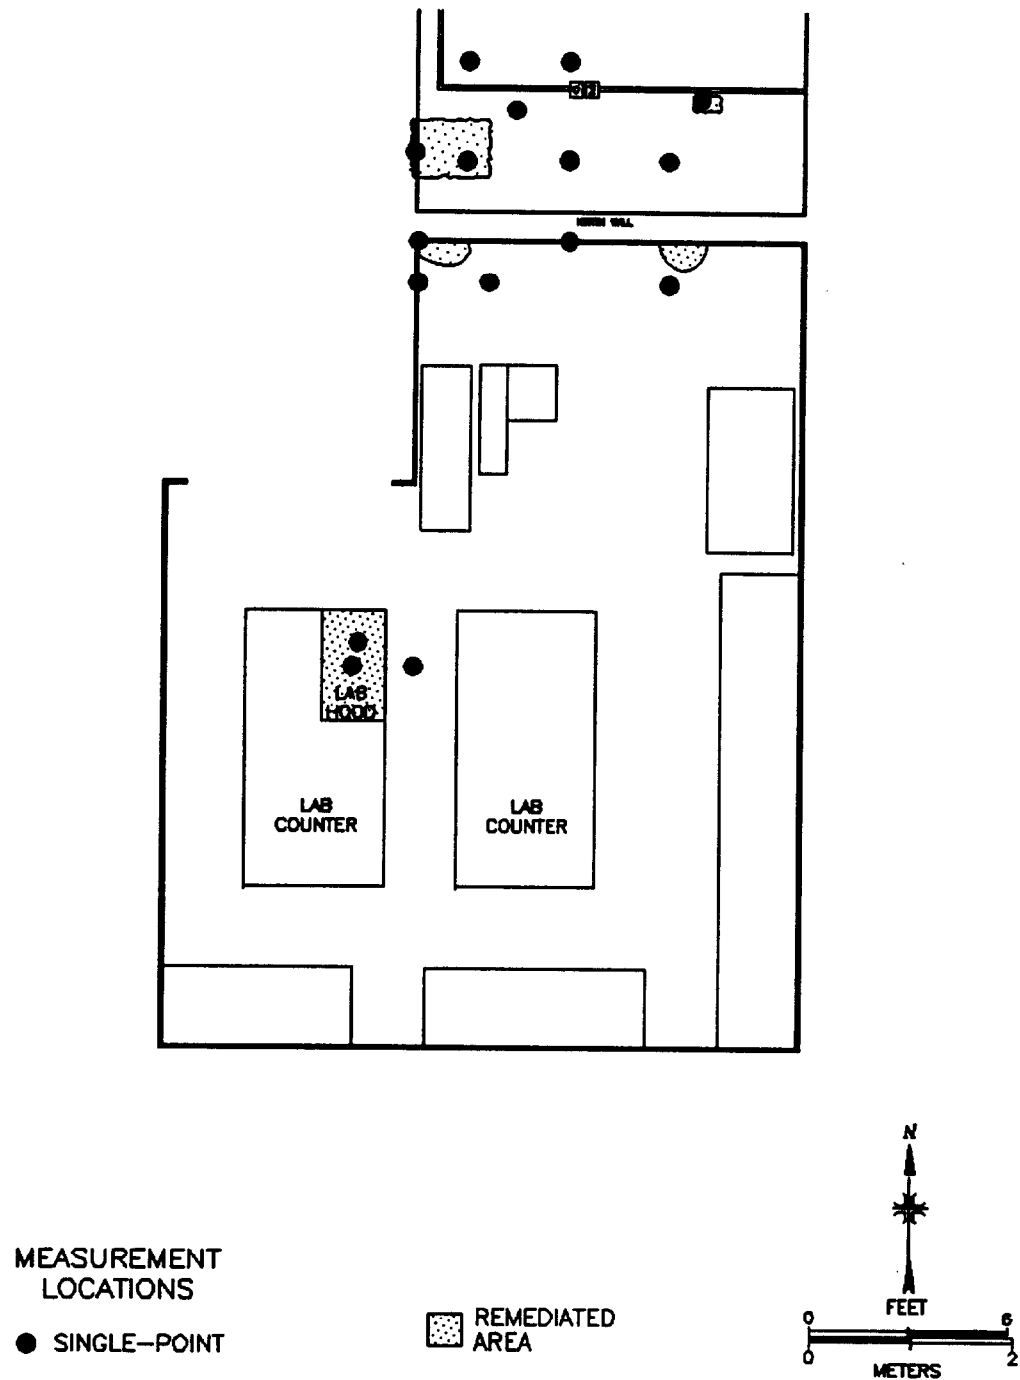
Building 31, Room 2 Floor, North Wall, and Counter Space – Remediated Areas and Measurement Locations
